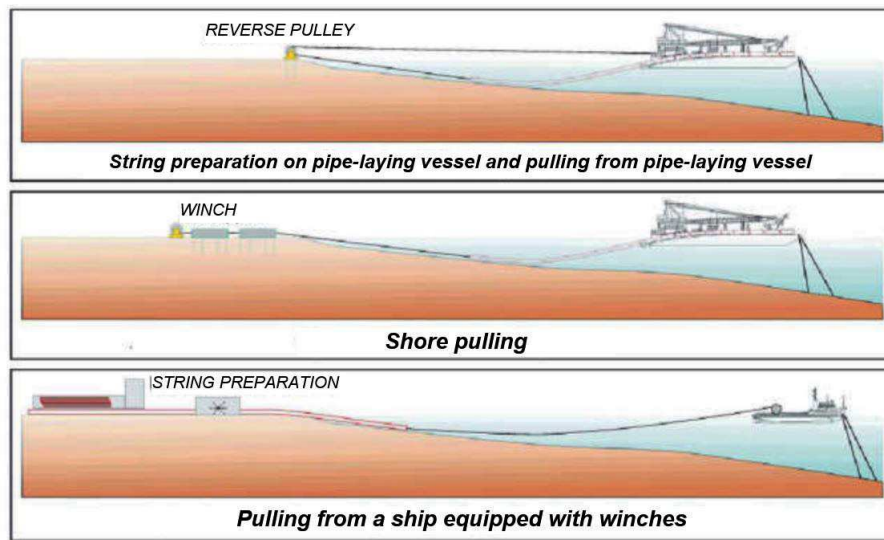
Pipeline laying methods of pulling pipeline in construction of shore crossing [3]
